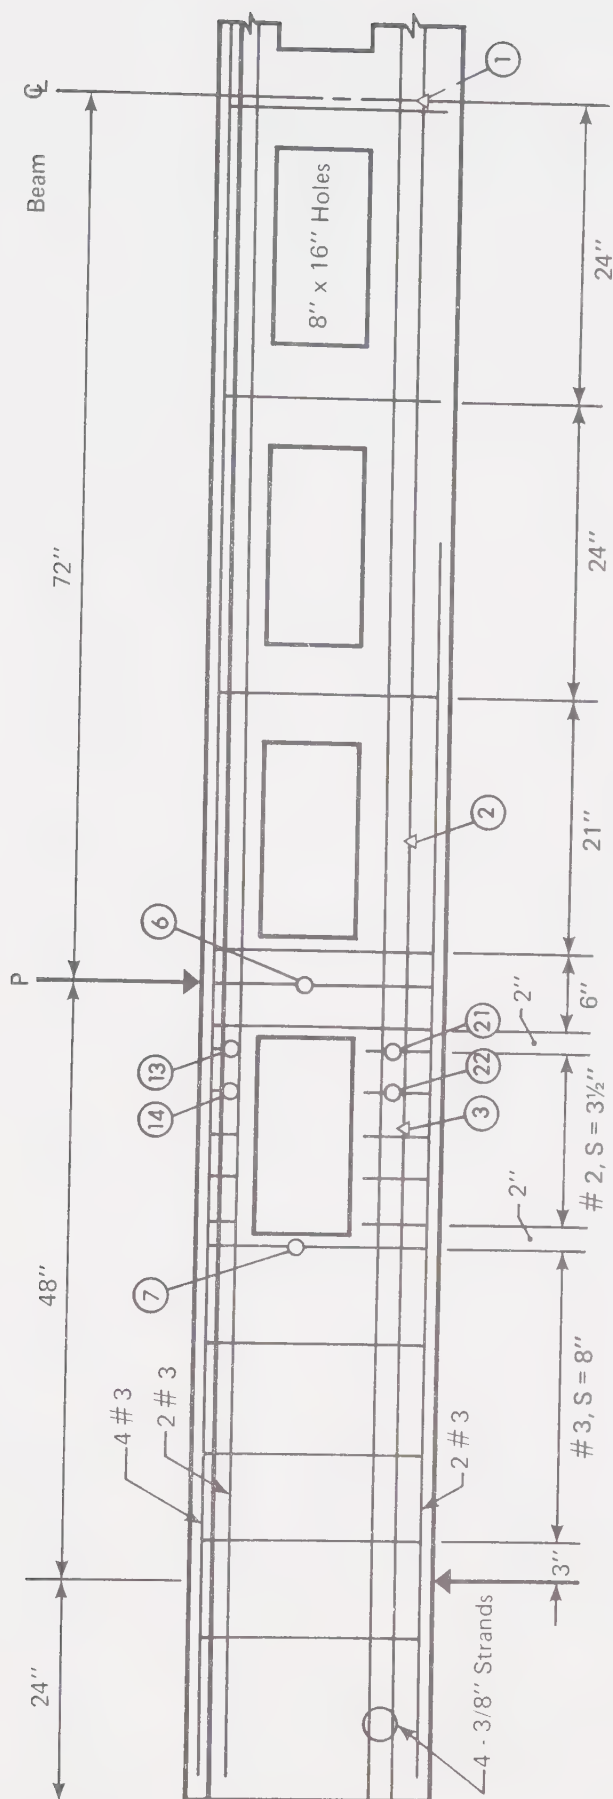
Reinforcement Details and Strain Gage Locations for Beam 2-16-4
